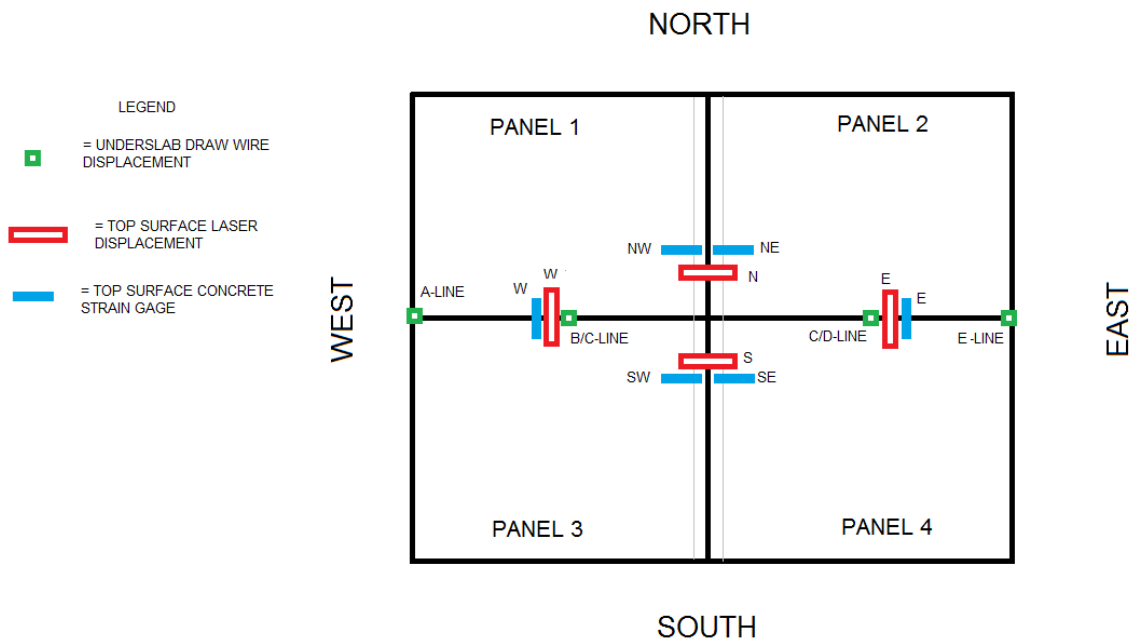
External Slab Instrumentation Plan – Load Case I
